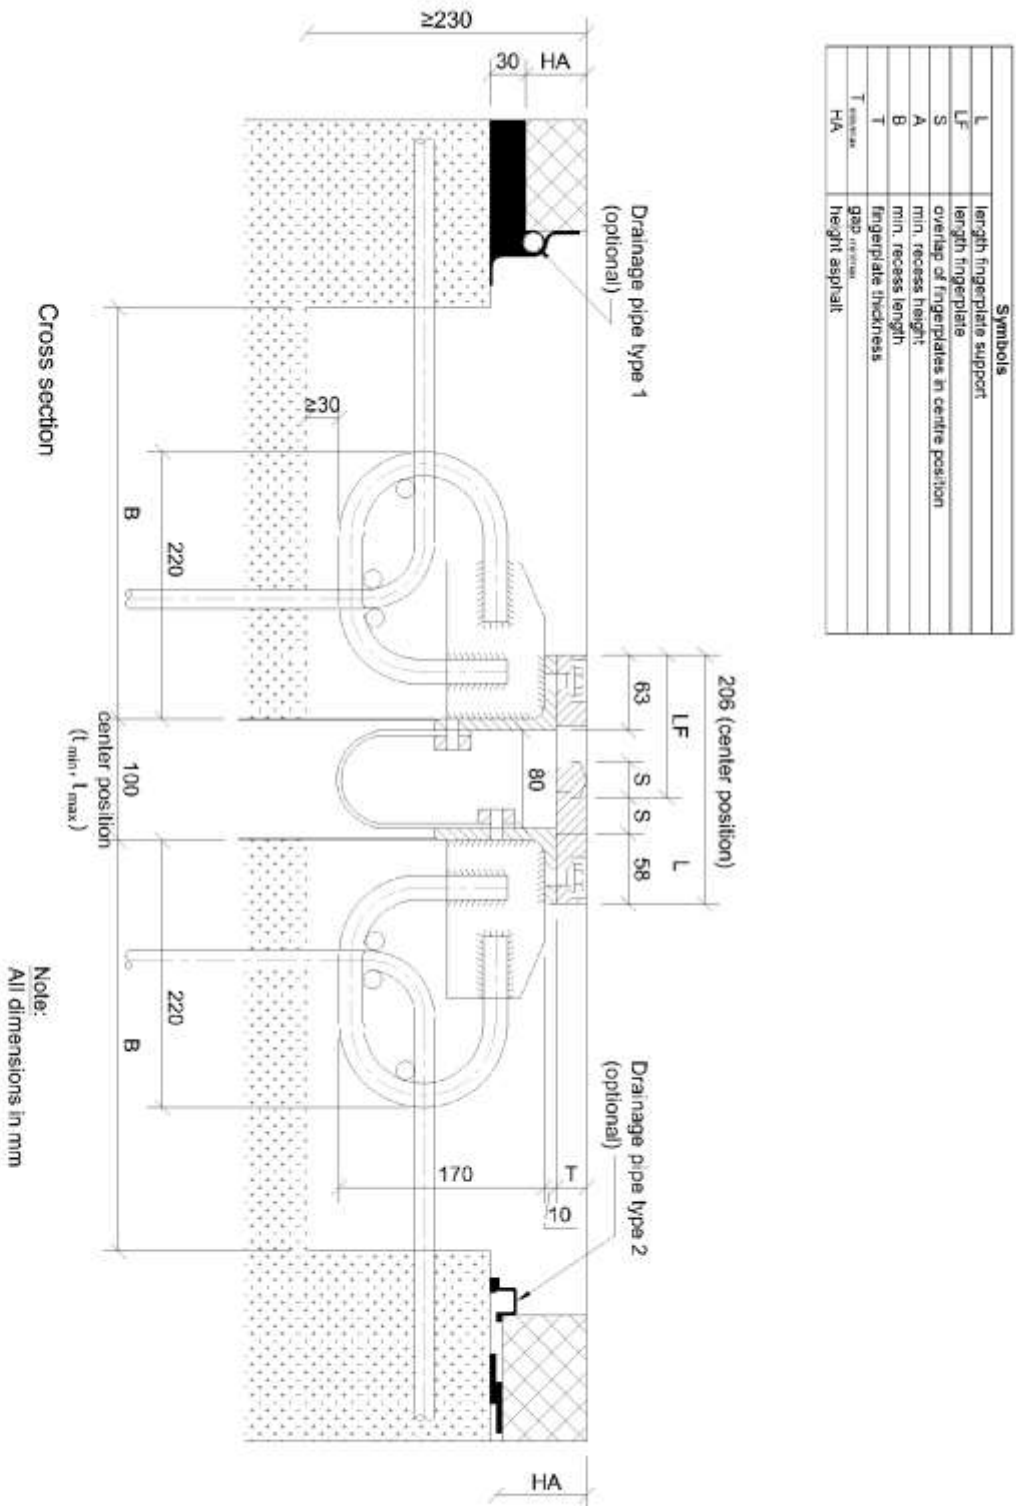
Typical cross section of Tensa Finger RSFD expansion joints
